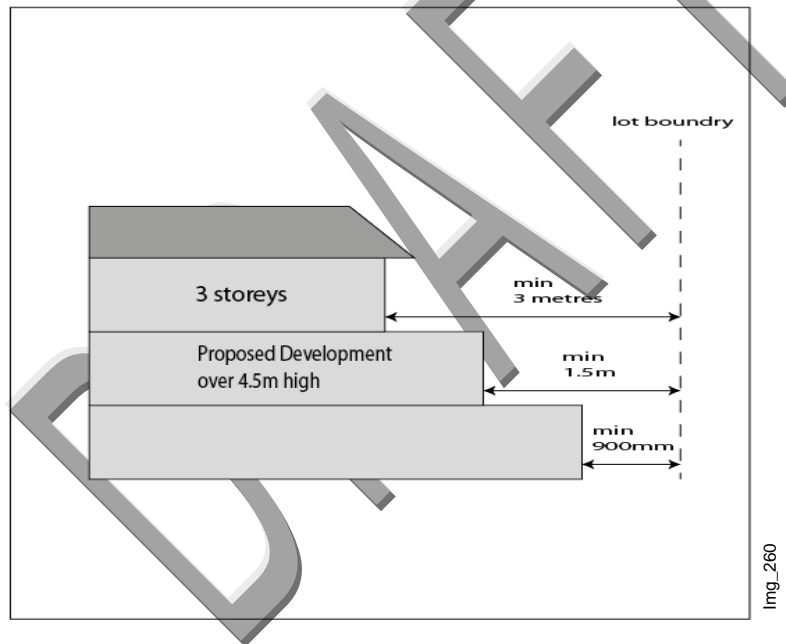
Side Setback for community title subdivision dwellings in C4 zone
